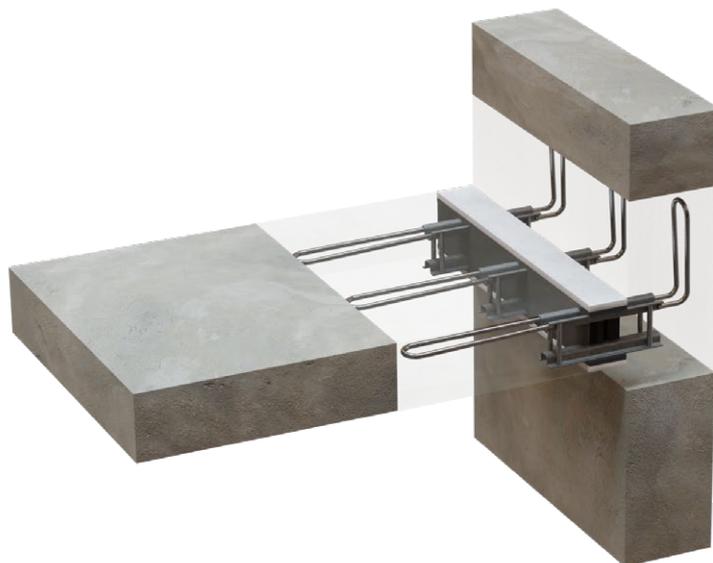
The TIPOMEGA® connector anchored in the wall using UG3-shaped bars, welded to the upper profile and bent upwards
